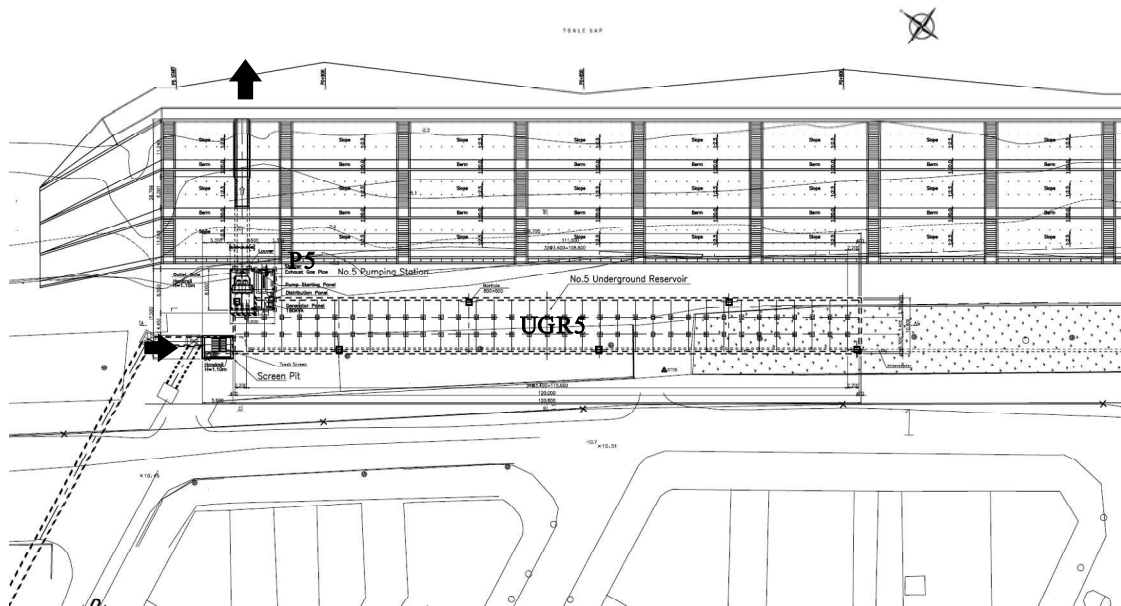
Layout of Underground Reservoir No. 5 and Pumping Station No. 5
